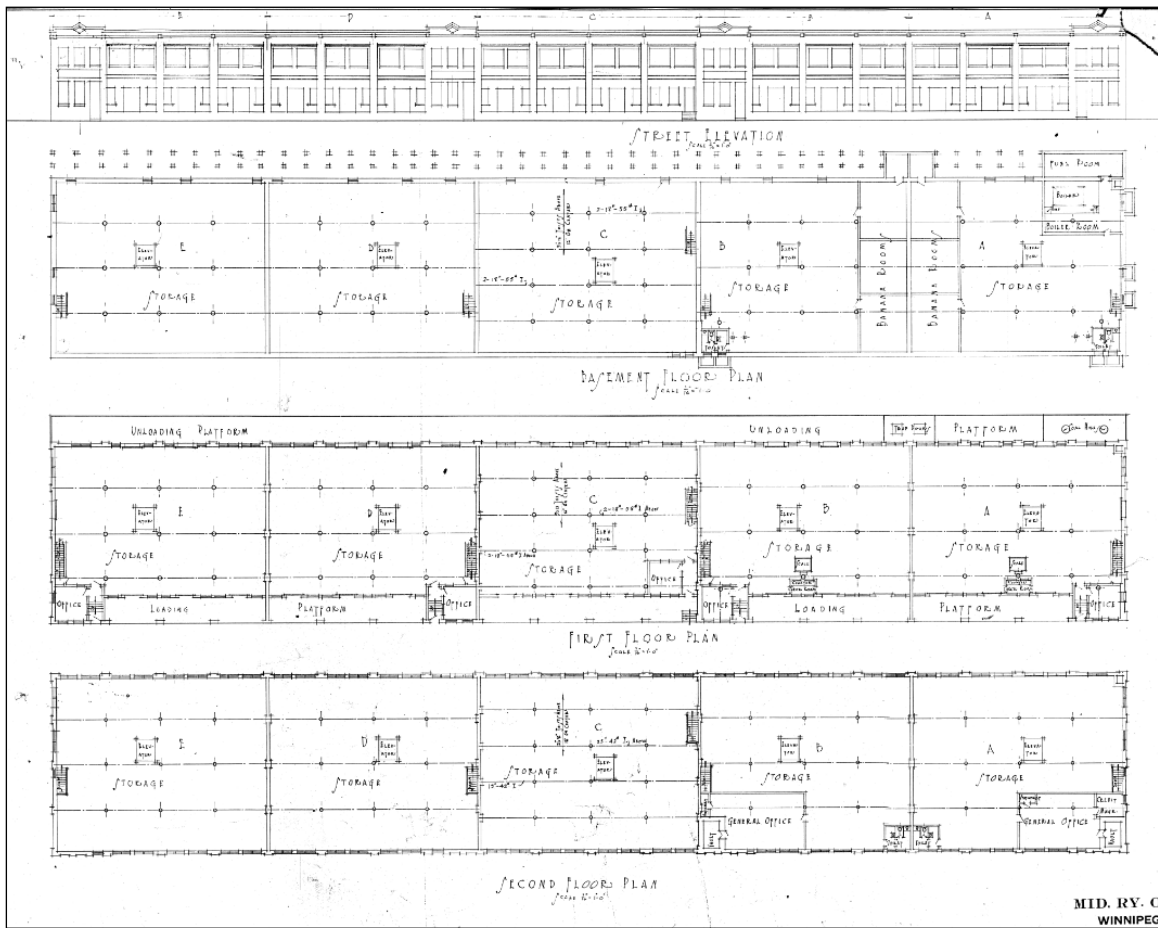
Midland Fruit Track Warehouse, 401-433 Ross Avenue, Architect's plans #2297/1914.
